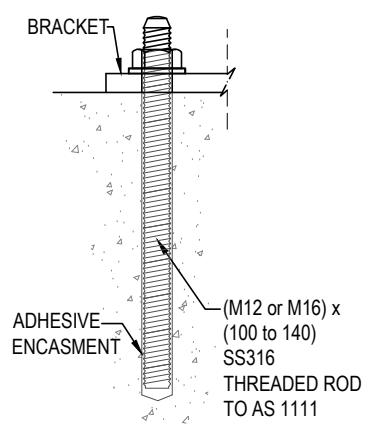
F (SECTION VIEW) ADHESIVE CAPSULE CONCRETE ANCHOR
